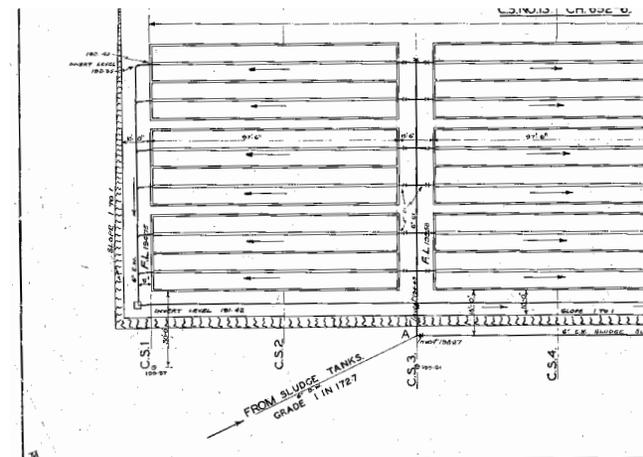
Plan layout of drying beds (Daspoort Archive)
